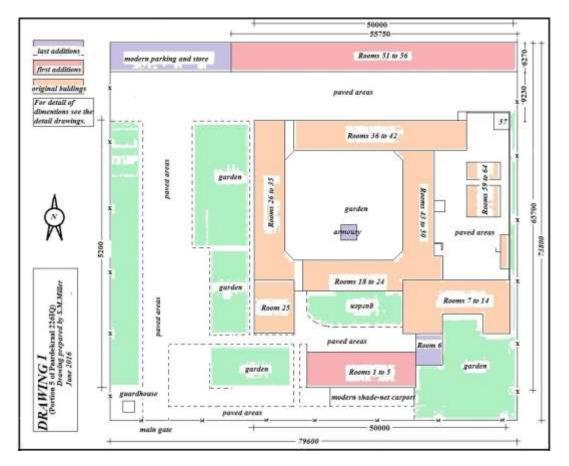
Above is the site layout of the structure under investigation. (Drawing S.M. Miller 2016.)
